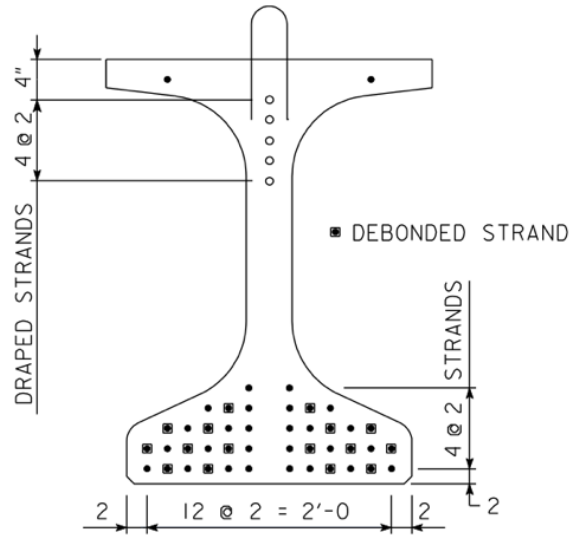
Mars Hill Bridge I-girder cross section [49].
